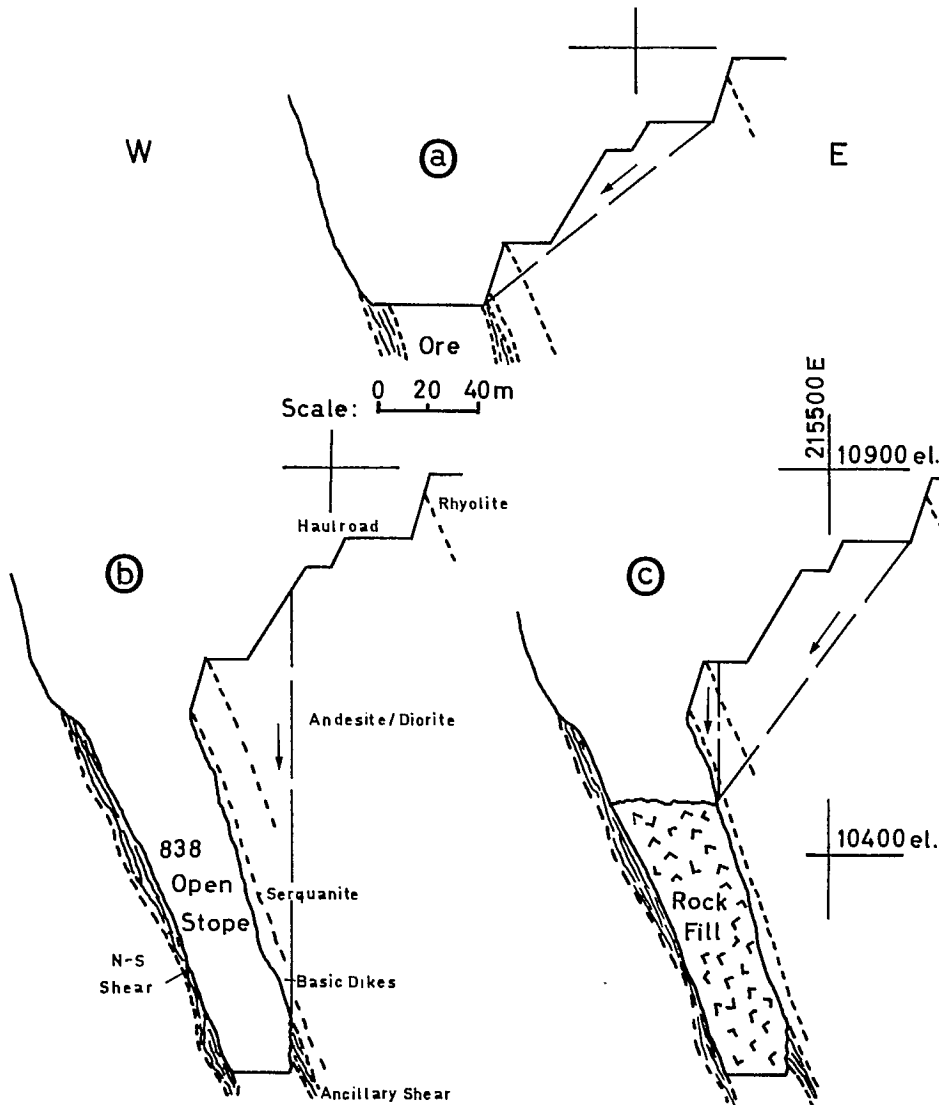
Significant excavation stages for hanging wall: (a) final pit slope, (b) overhang of 838 stope and (c) stope above 838 stope with cemented rock fill.
